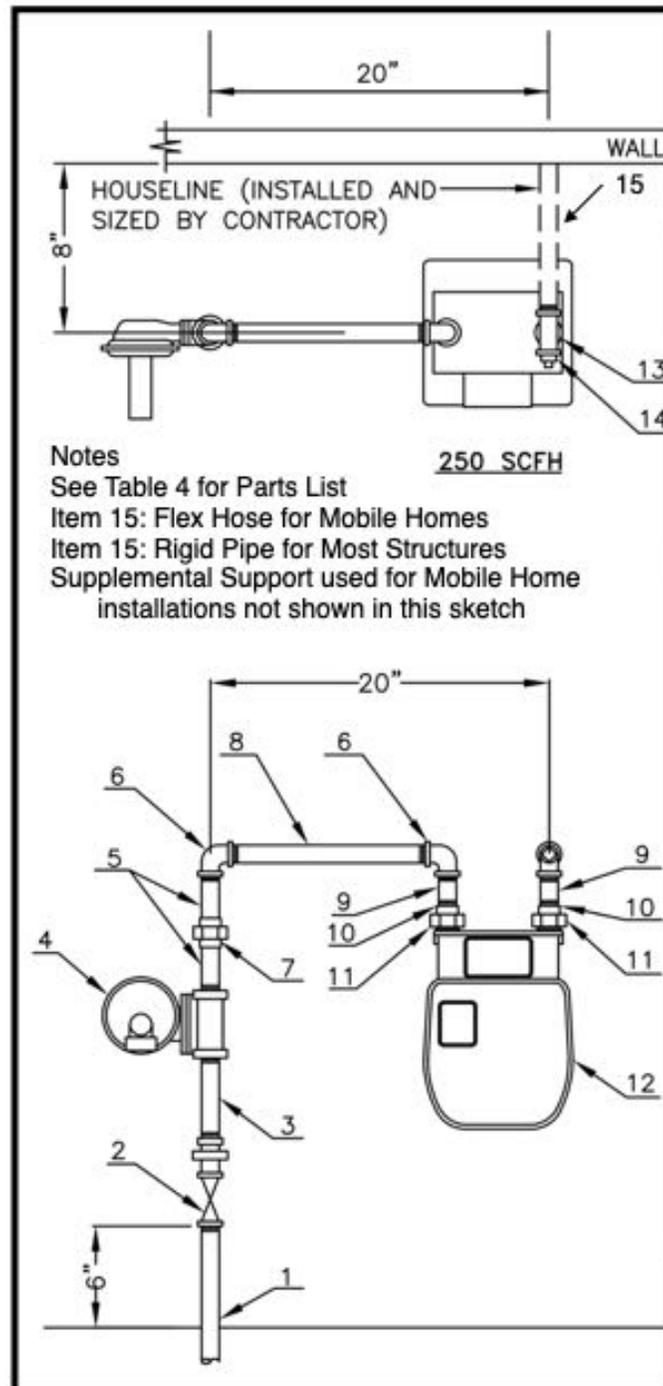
Common Riser and Gas Meter Typical Installation (see Table 4 for parts list)
